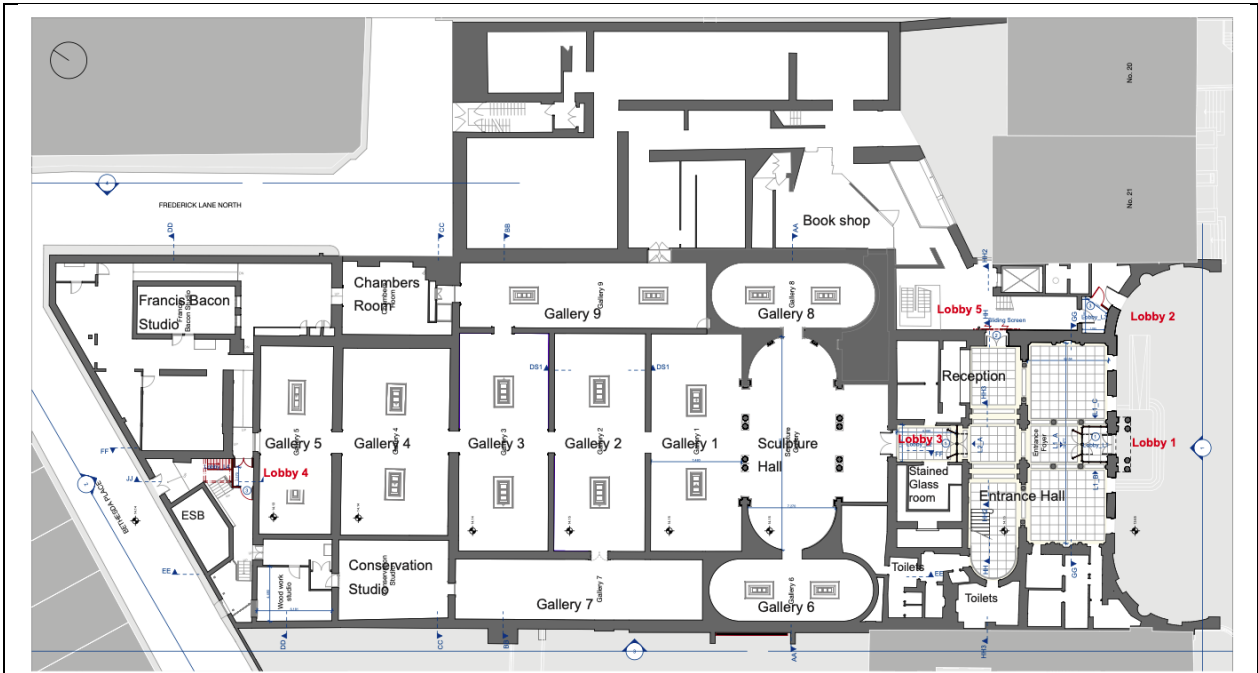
Ground floor plan showing proposed Lobbies and their designated numbers. Lobbies no.3 and 5 have been omitted in this application. (Source: Shaffrey’s Protected Structure Impact Assessment, pg.12)
